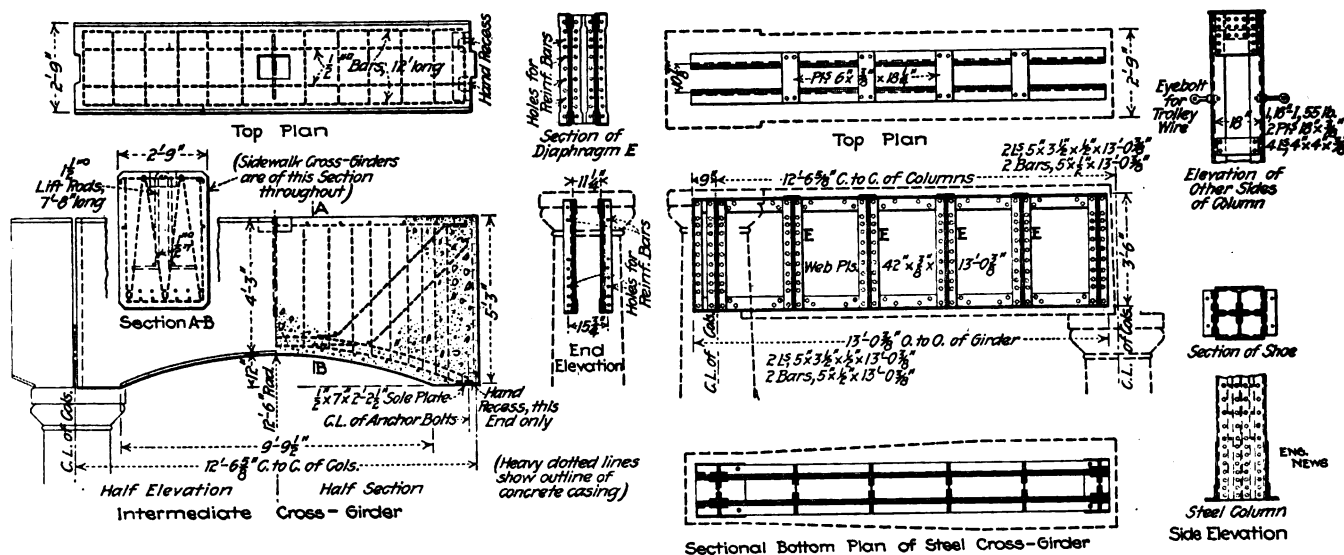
COLUMNS AND CROSS GIRDERS OF SUBWAY BRIDGES; ROCK ISLAND LINES
